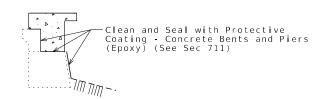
DETAILS OF CONCRETE REMOVAL AT END BENTS NO. 1 & 13
